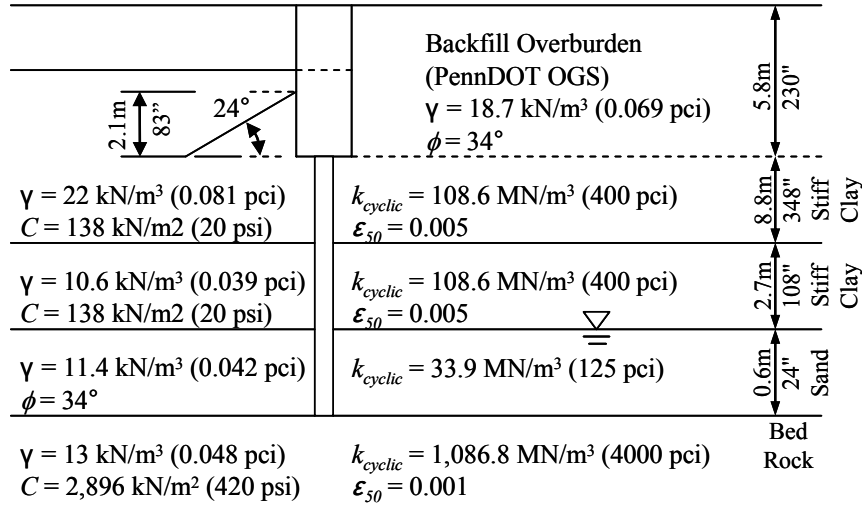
Bridge 203 Soil Properties under Abutment 2.
